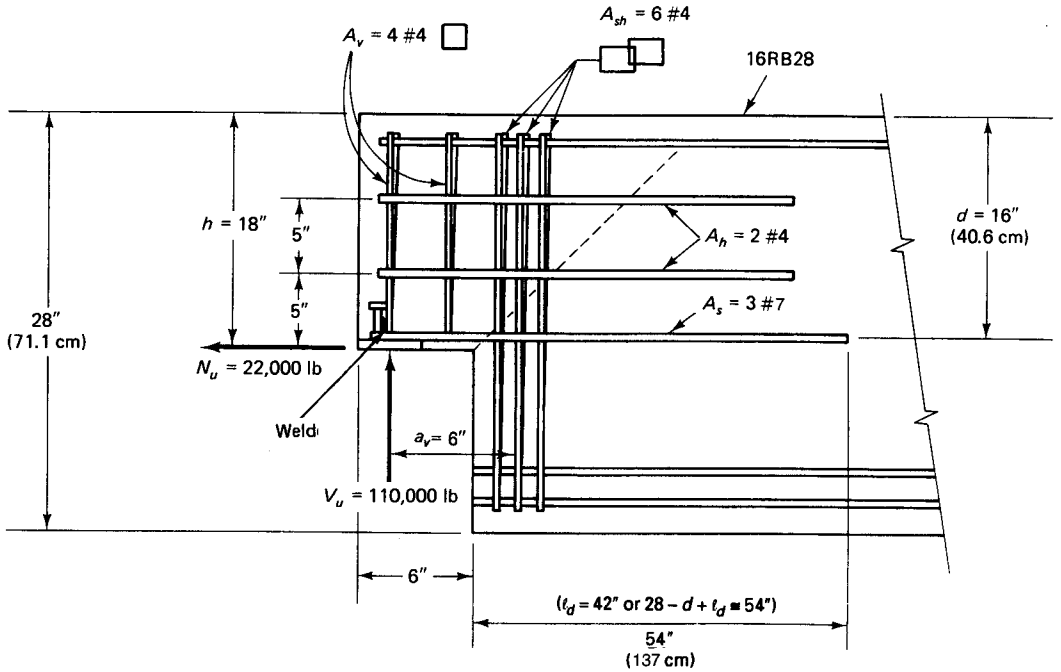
Reinforcing details for dapped-end beam connection in Example 10.2.
